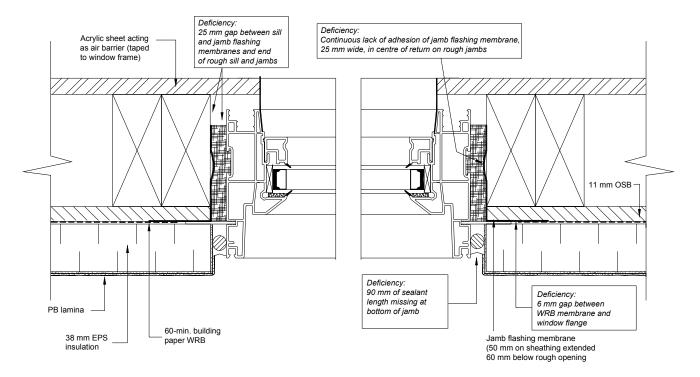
Wall/window interface for specimen No. 7 - horizontal section
